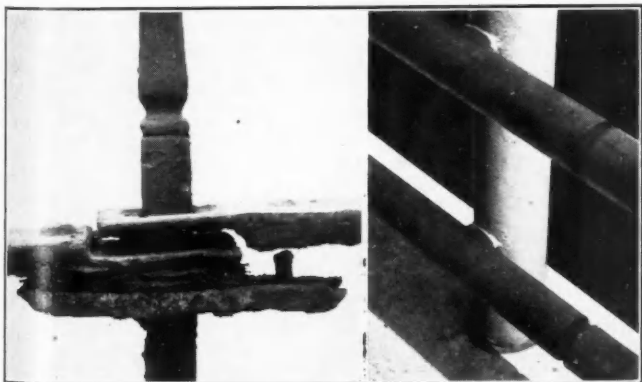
Effect of Design on Corrosion. Railings at Westminster Abbey (left) and on Waterloo Bridge (right). The lapped joints of the Westminster Abbey railings, erected in 1746, have proved a source of weakness. Heavy rust scale has formed inside them and burst the bolts. The cleaner design of the Waterloo Bridge railings (1945) affords little opportunity for rusting due to local lodgement of dust and moisture.
